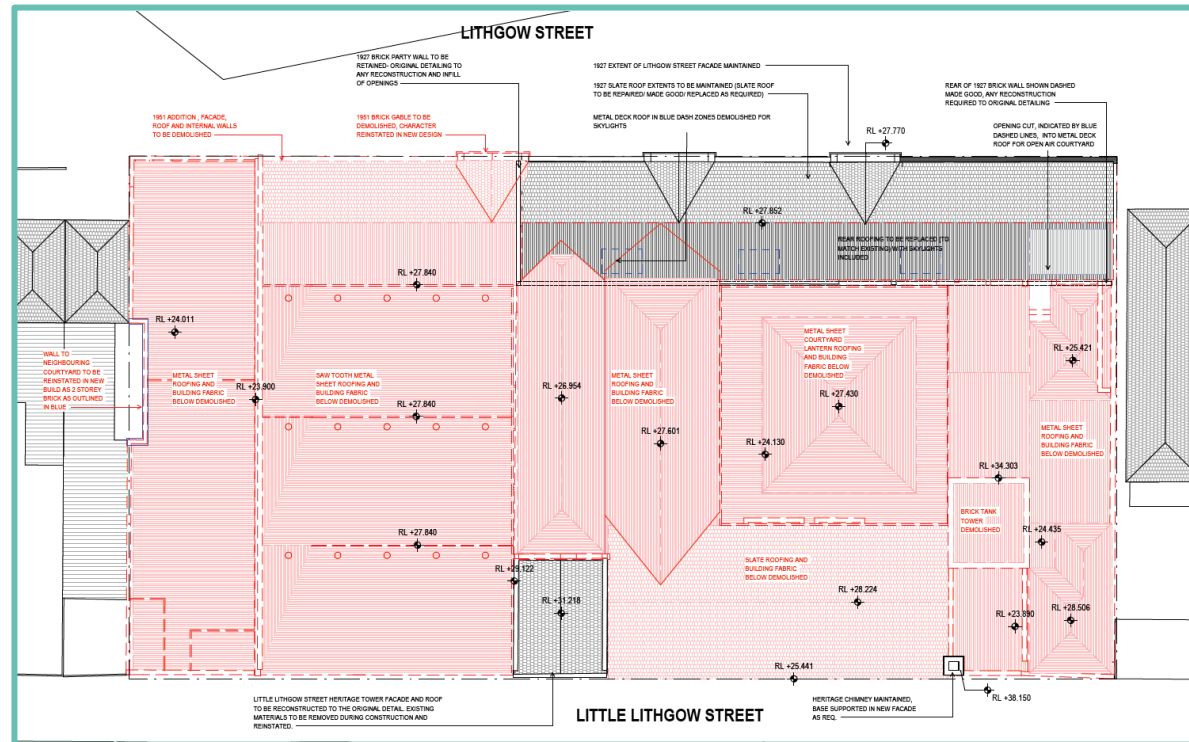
The demolition plan for the site. Source: Warren and Mahoney.
